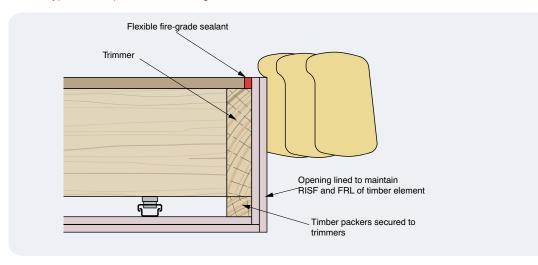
Typical riser penetration detail through a fire-protected timber floor.
